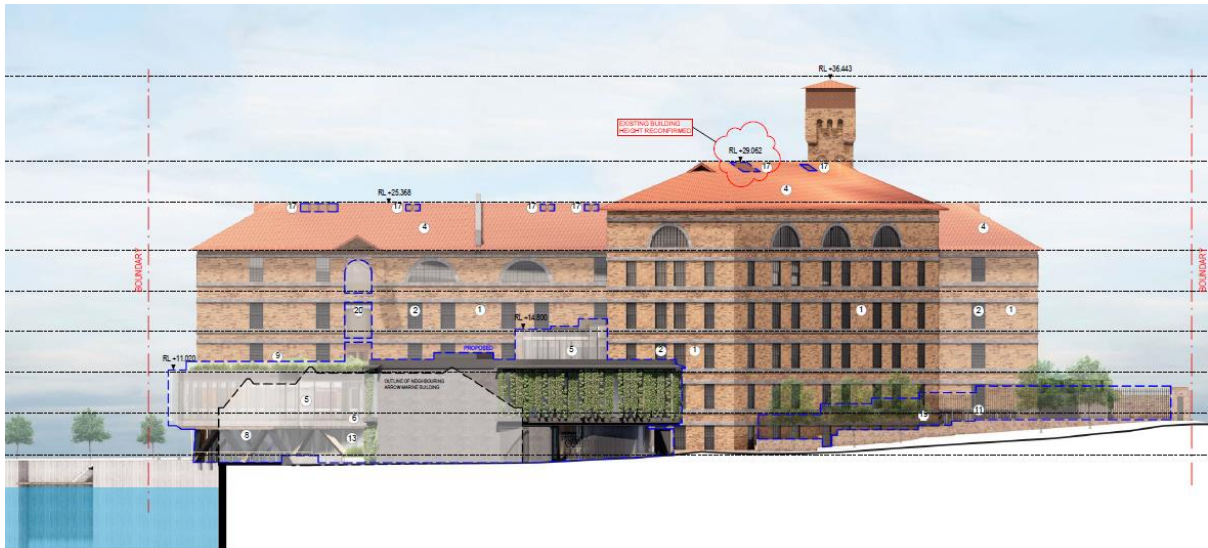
Proposed west elevation, including proposed works to Building D (D/2021/1507)
